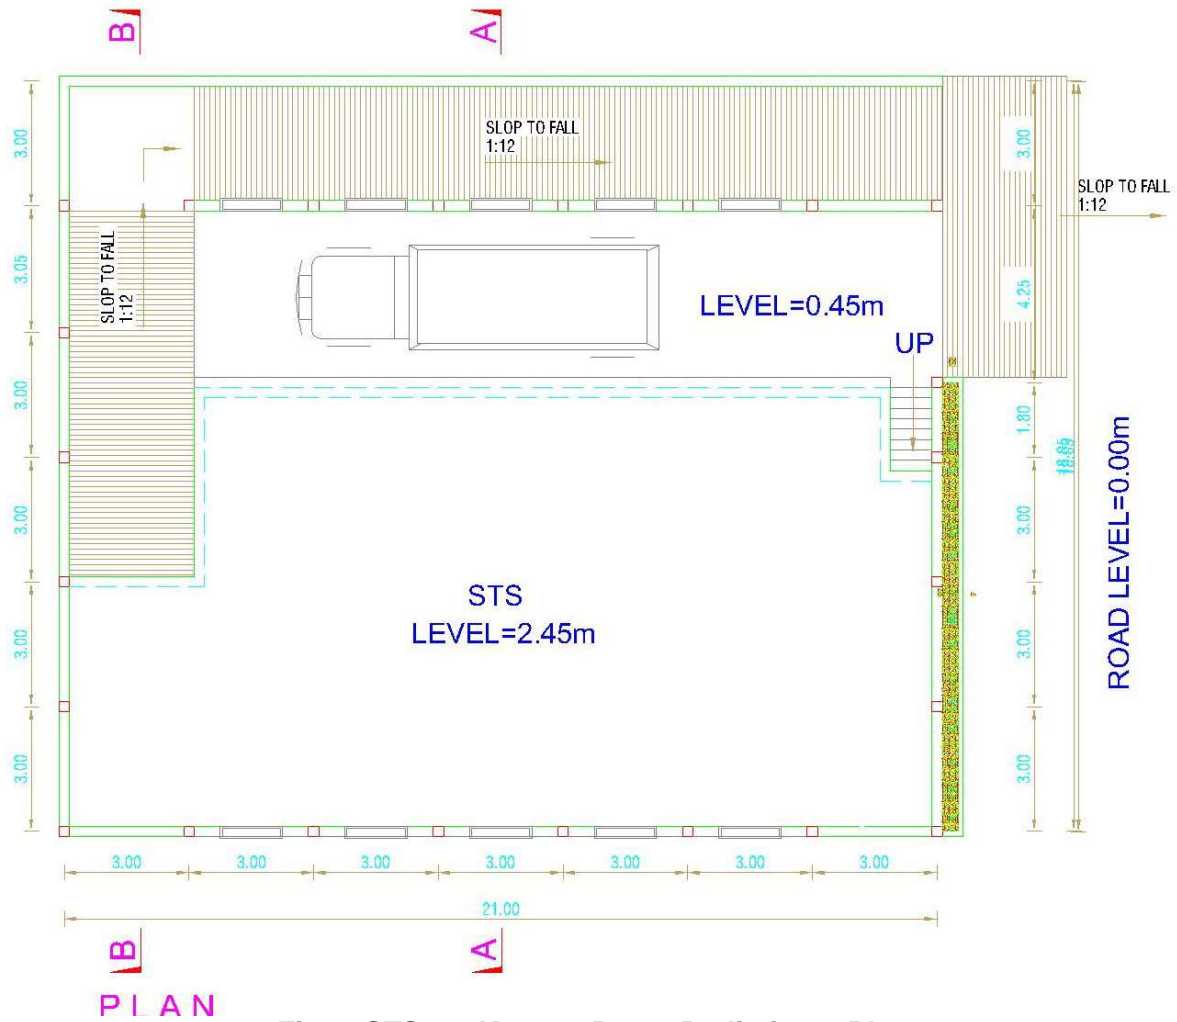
STS – 4 Kawran Bazar Preliminary Plan
